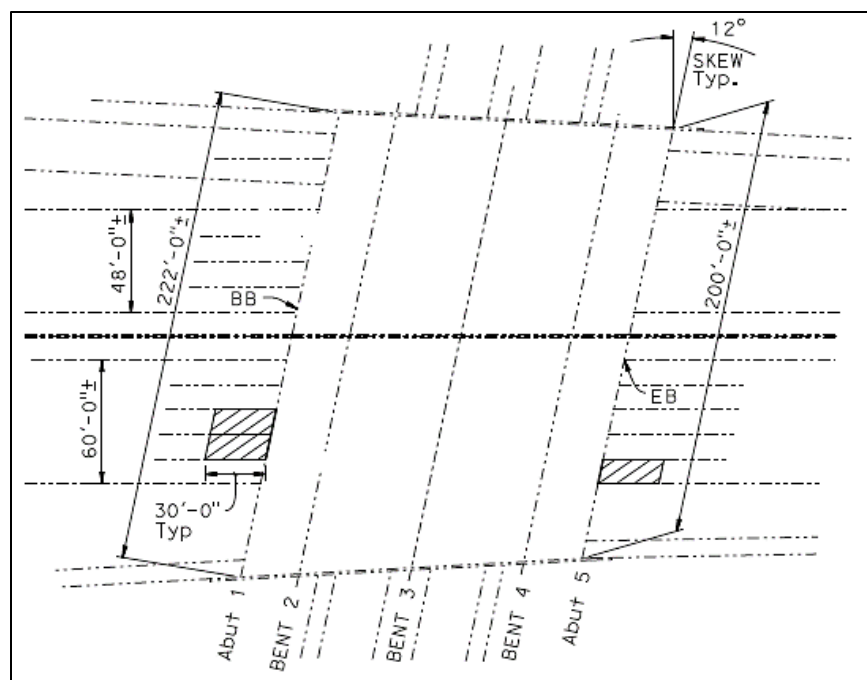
Approach Slabs with Roadway Edges Parallel to Skew
